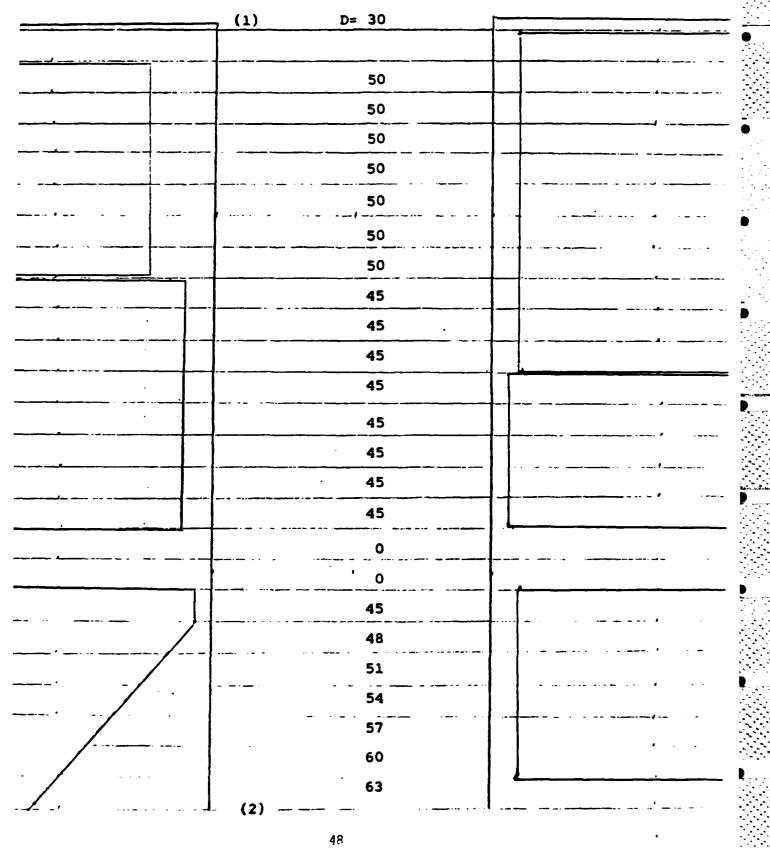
a shows how the facing walls are drawn on Form C using the 20-foot increment lines. Walls perpendicular to the facing wall are simply drawn back to the margin line. This permits the proper location of setbacks and walls that form angles to the street. These factors are vital to accurate computations.
